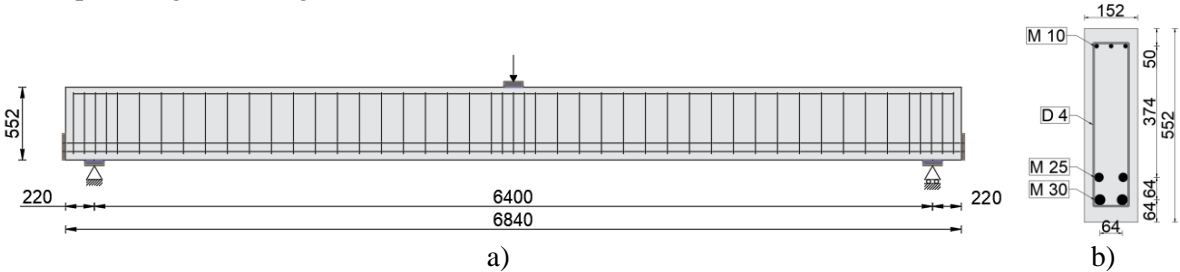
a) Longitudinal section with beam geometry and reinforcement layout, b) cross-section [6].
